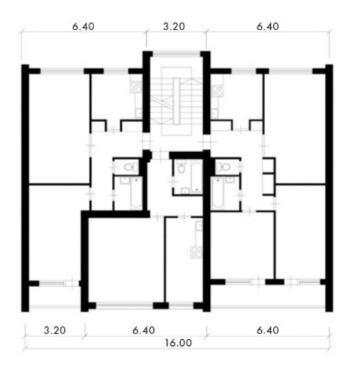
4. Series 103 typical plan. 2nd floor.
